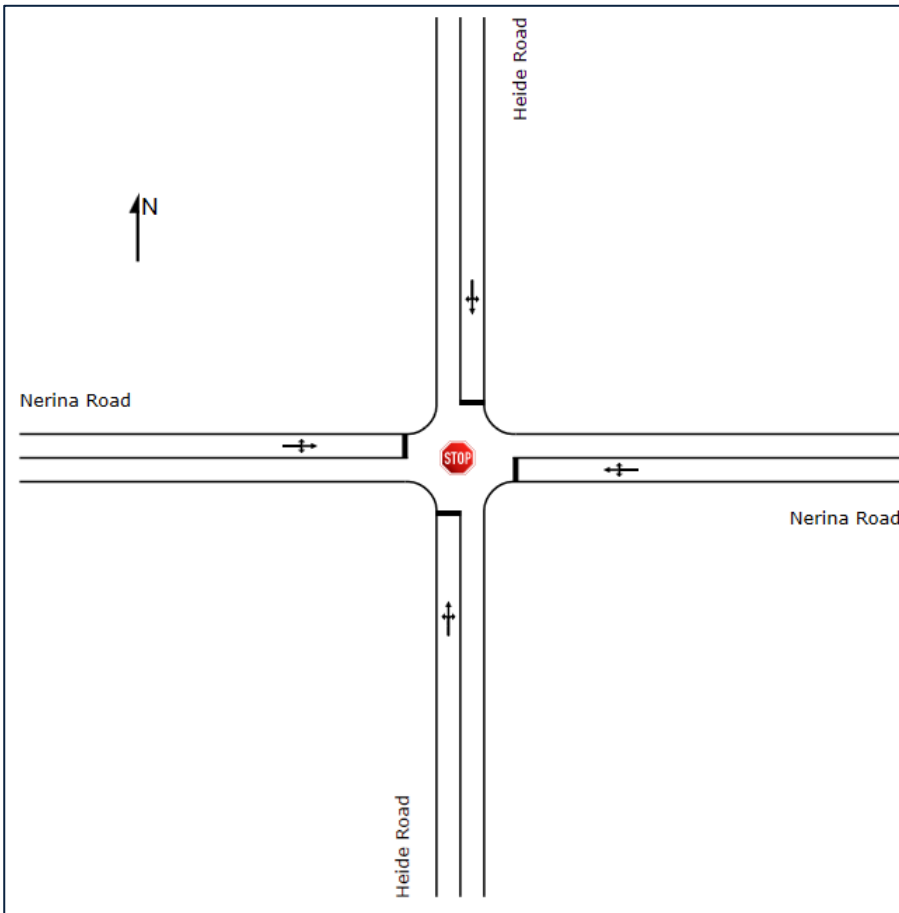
Existing Intersection Layout: Heide Road and Nerina Road
